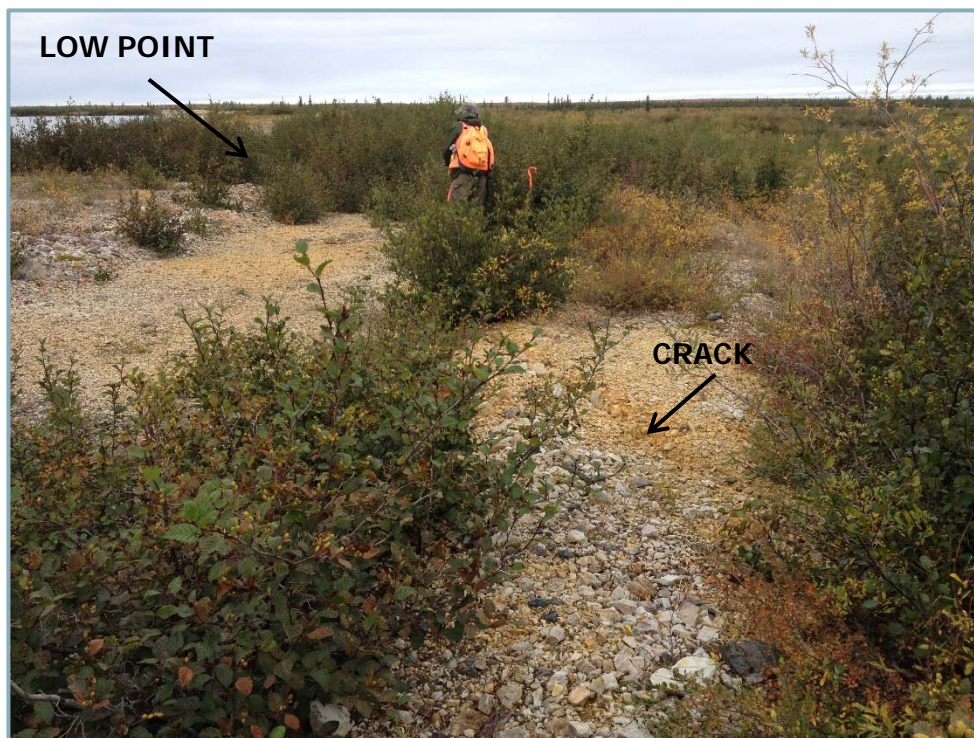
Cracking where access road adjoins Dam 1 crest (looking north).
